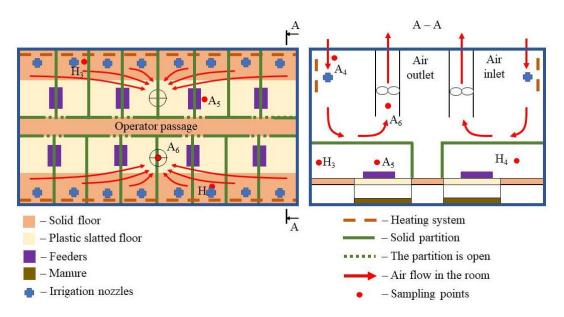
Scheme of the ceiling ventilation system (option 2)
